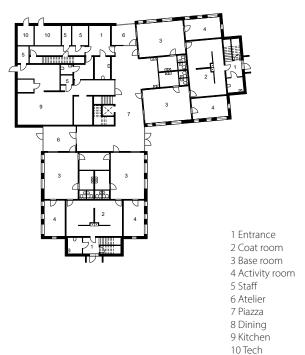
Plan drawing of Hoppet preschooll in scale 1:600. Drawn by author based on work by LINK (2021).
